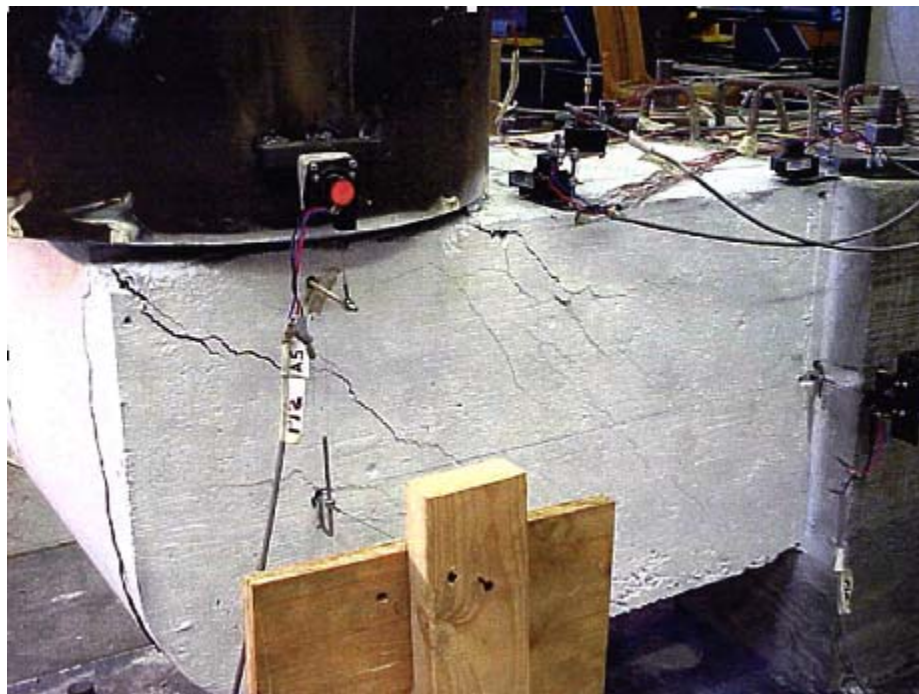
Torsional Cracks in the Outrigger Beam and the Joint of Specimen ASO at the End of the Test
